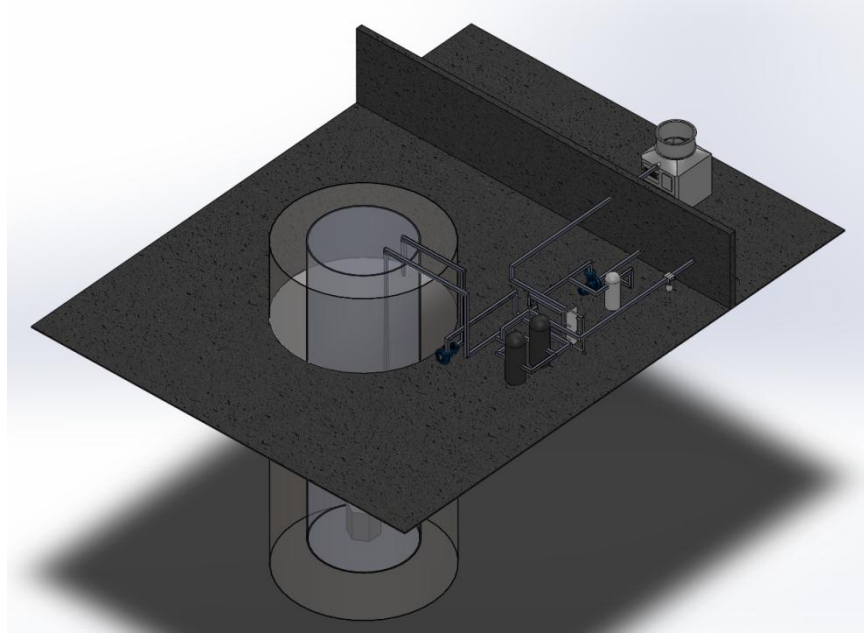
Rear Isometric View of Theoretical Replacement Cooling System
